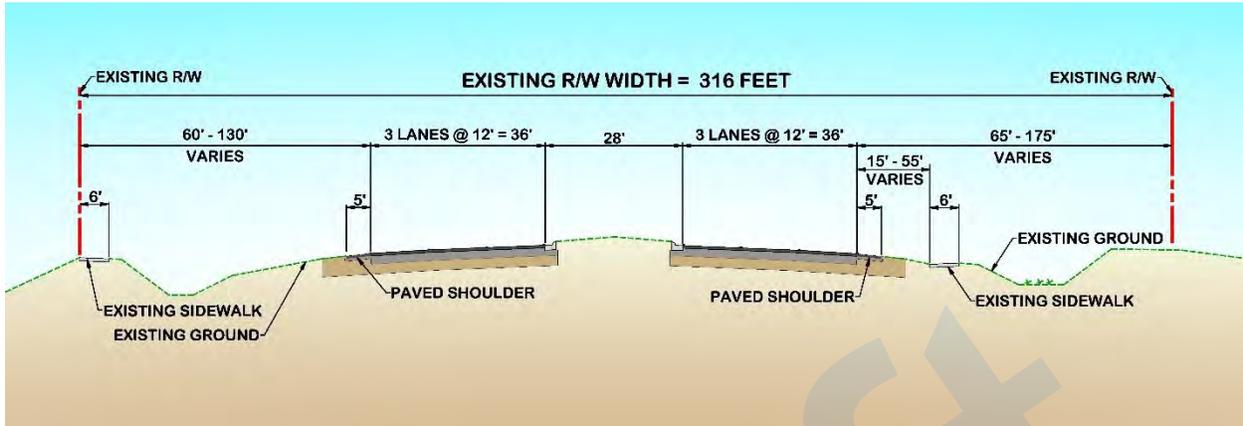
Existing SW 10th Street Typical Section - Quiet Water Business Park Entrance Road to Military Trail
